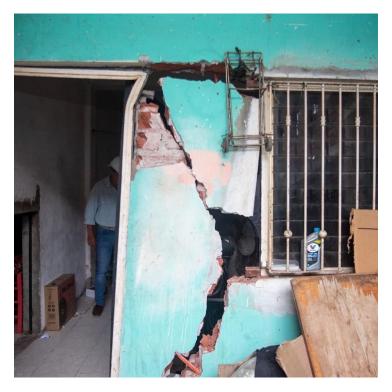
Collapsed URM wall in single-family house in Tecomán, Colima (Twitter, 2022f).
